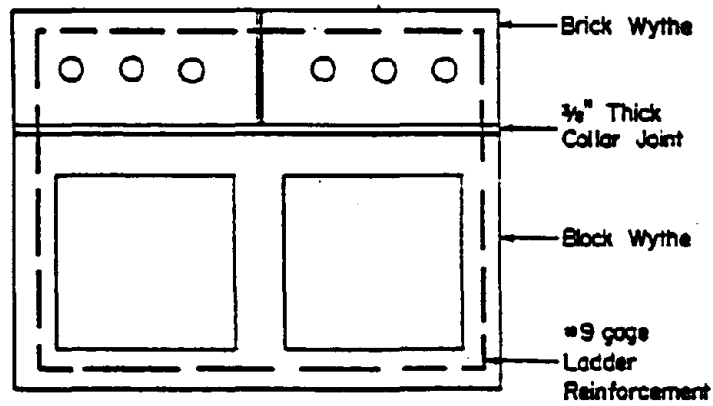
Composite Masonry Wall Cross-Section with 3/8 in. Collar Joint
